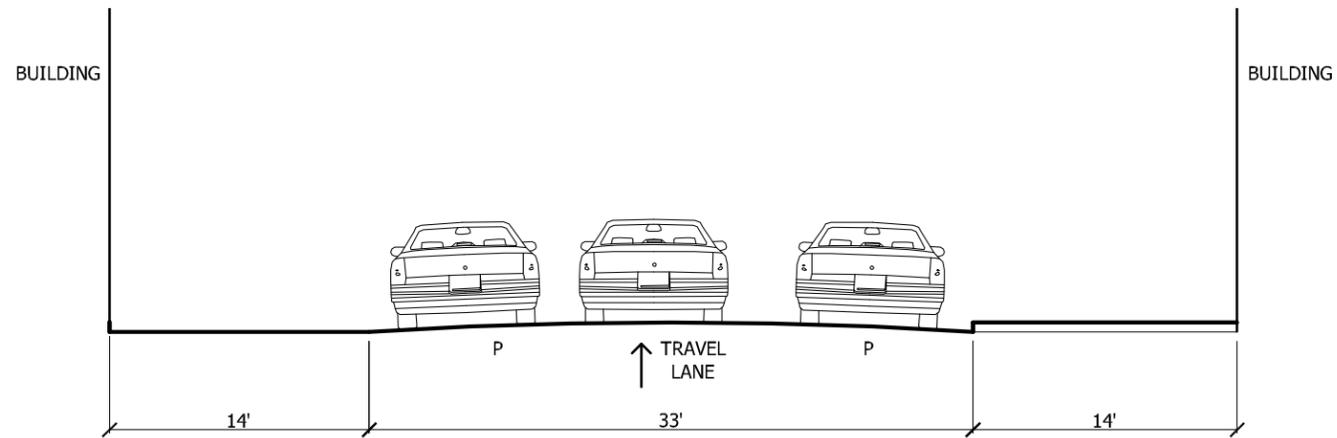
Existing configuration on Smith Street between Sigourney Street and Bay Street
